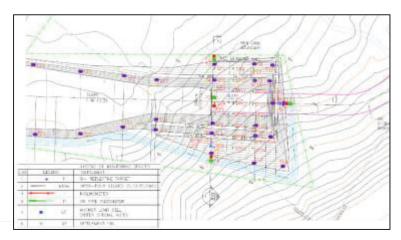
Monitoring and Instrumentation Plan at the MAT portal
